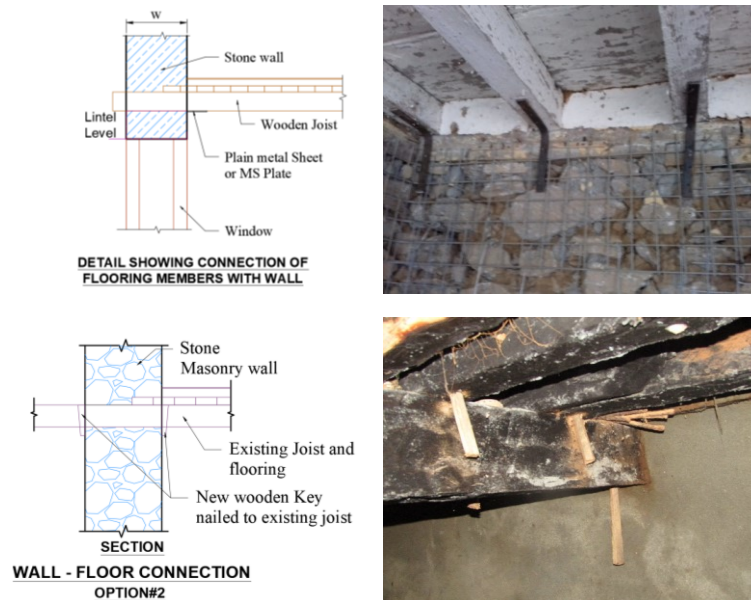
Drawings showing installation of Keys to connect floor and wall (left) and similar picture taken while implementing (right) (©NSET)
